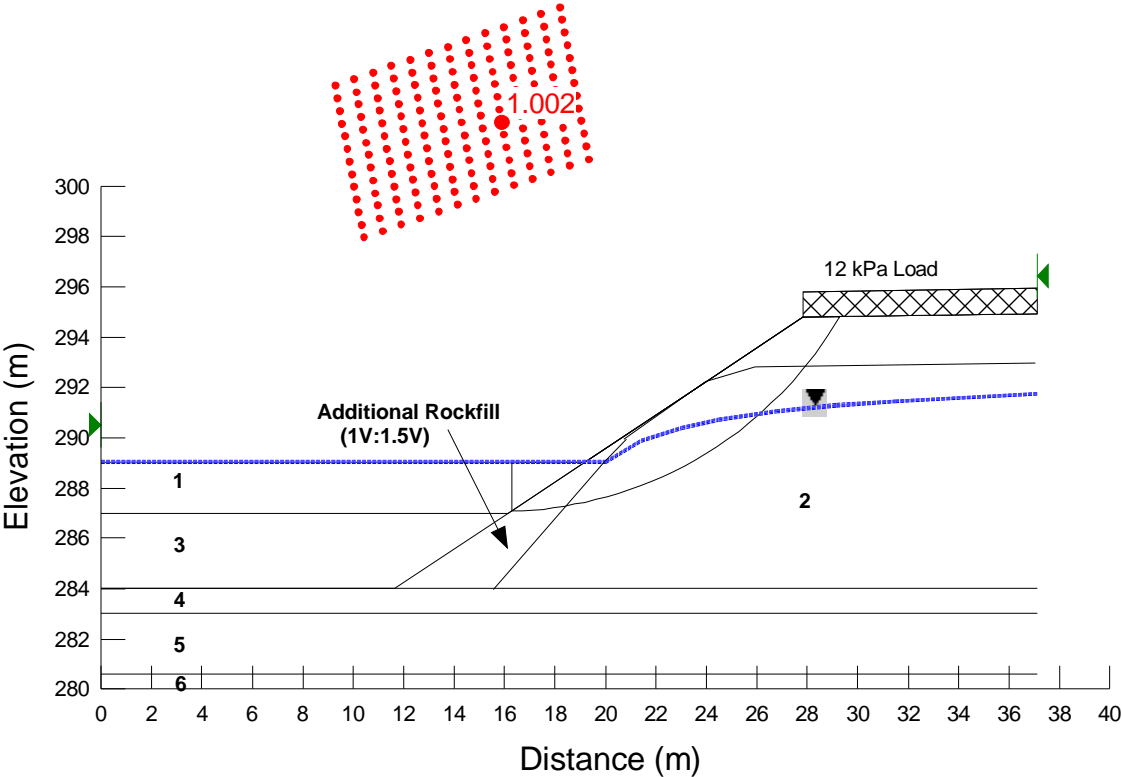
Stability of HWY11 Road Section at Sta. 14+850
